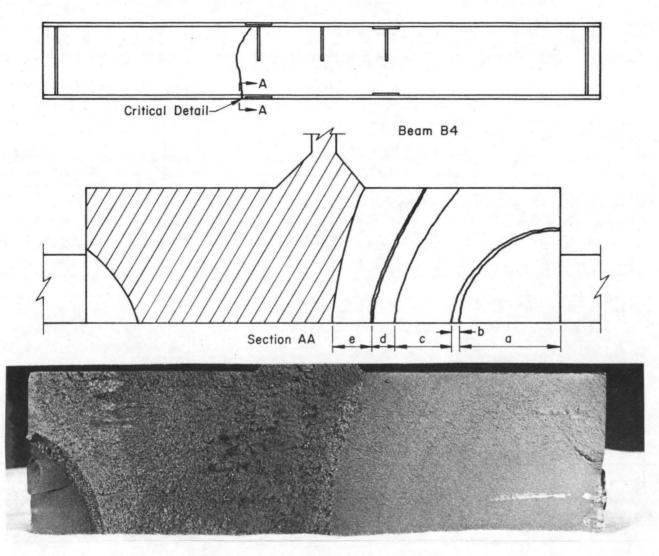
Fatigue and Fracture Surface, B4 (A36)
